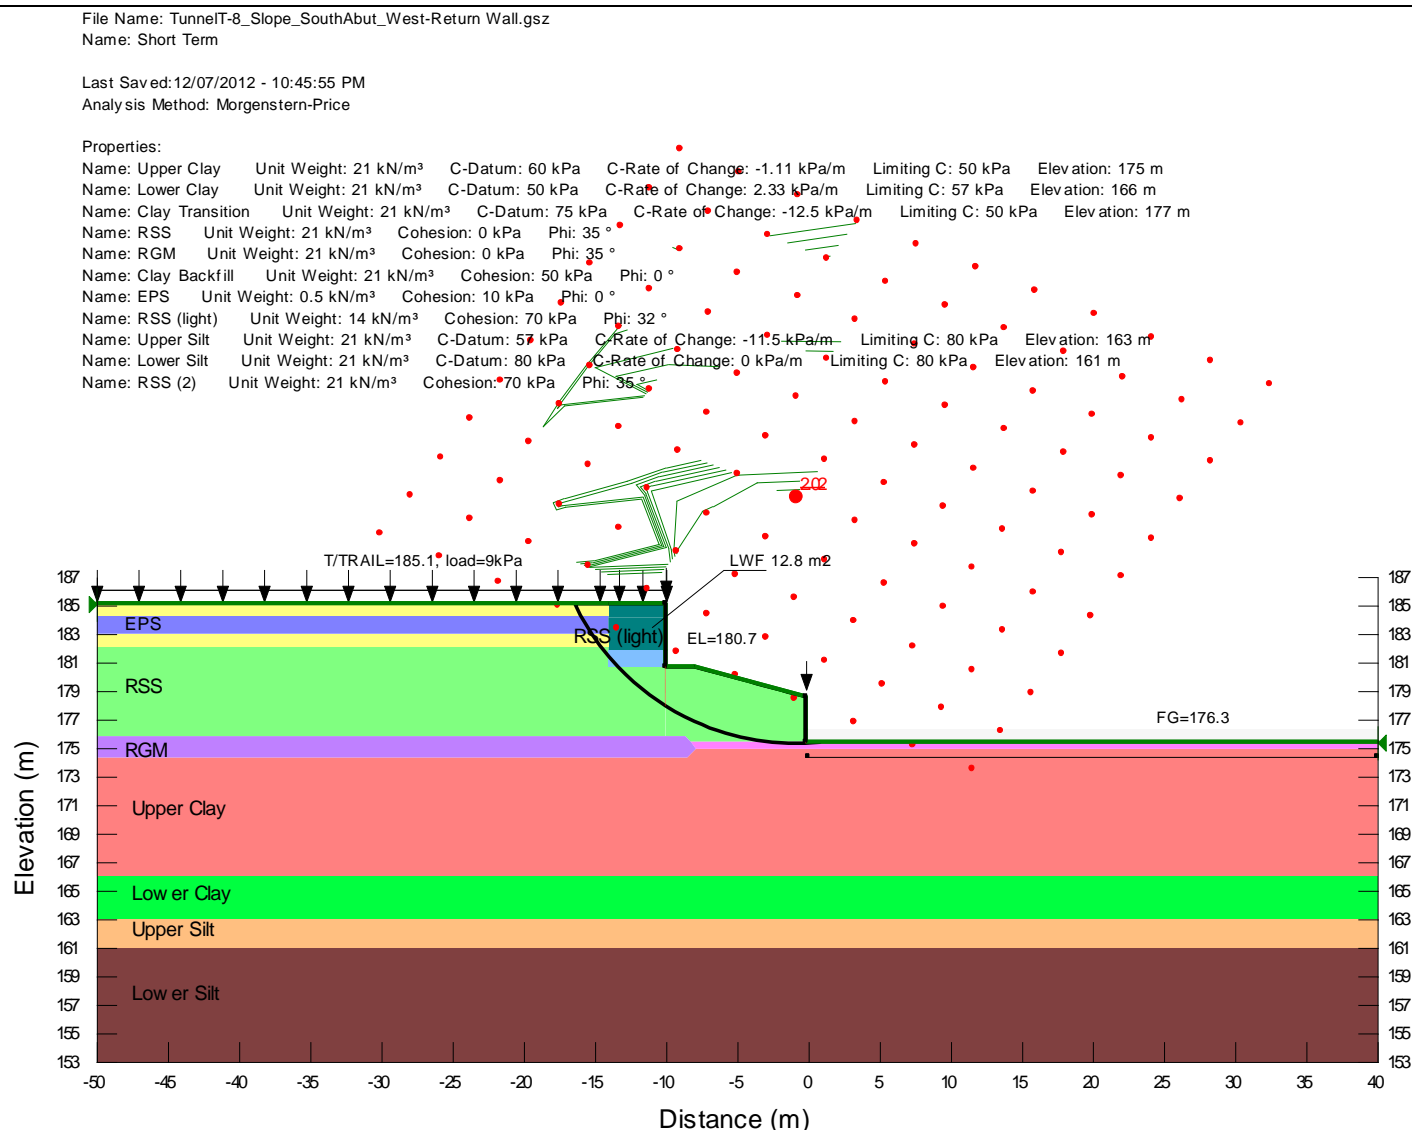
Global Stability Result – Return Wingwall South (West Segment)– End of Construction (Undrained) Loading
